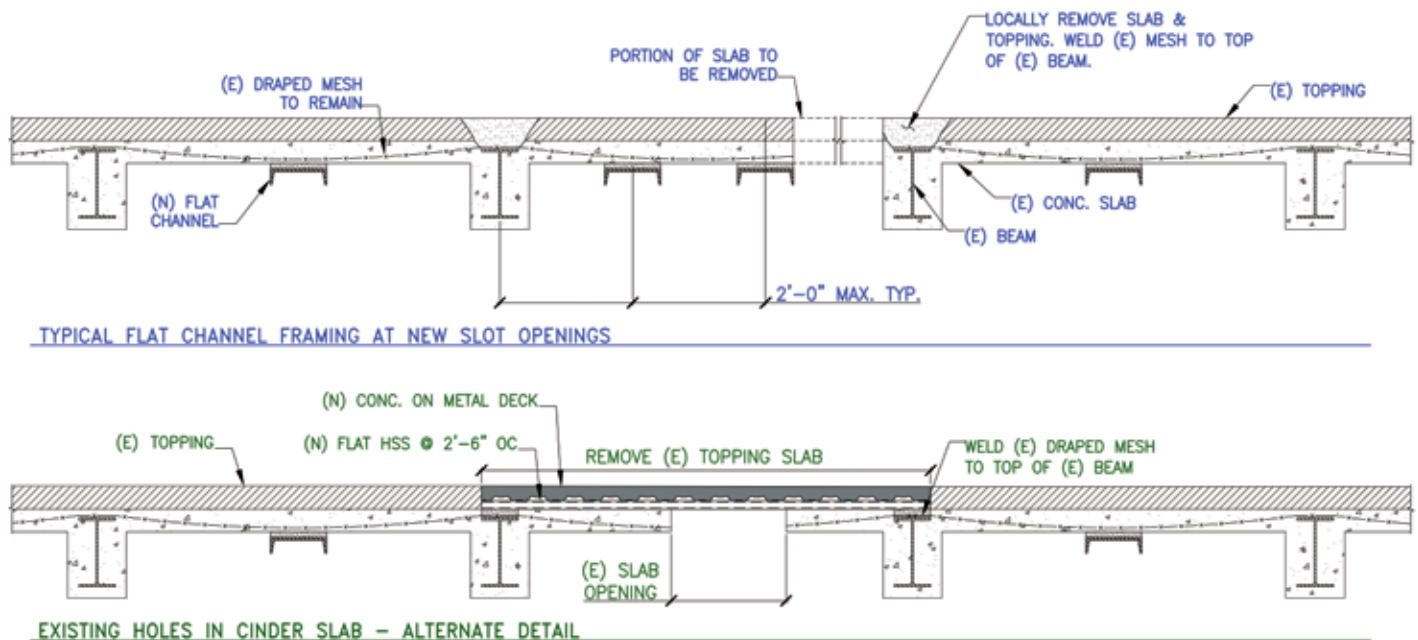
Draped-mesh cinder-concrete slab strengthening details at floor penetrations
